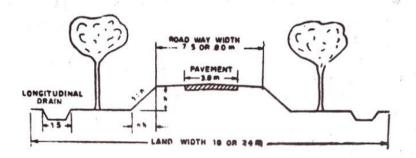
Cross Section of VR or ODR in Embankment in Rural Area
